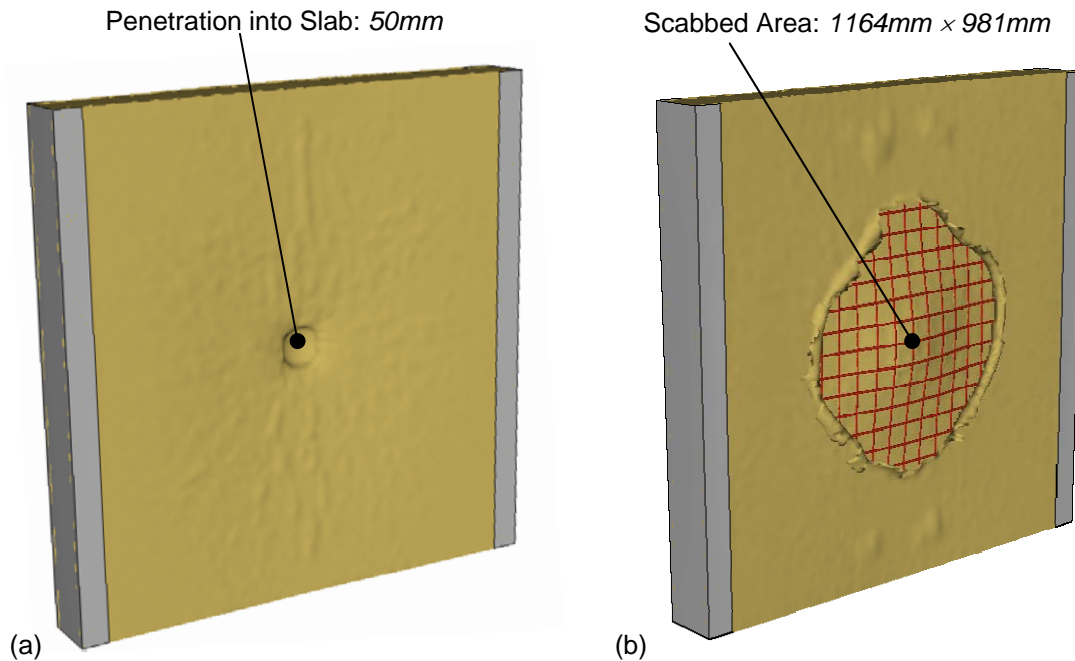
Damage of the reinforced concrete slab after impact: (a) front side, (b) back side.
